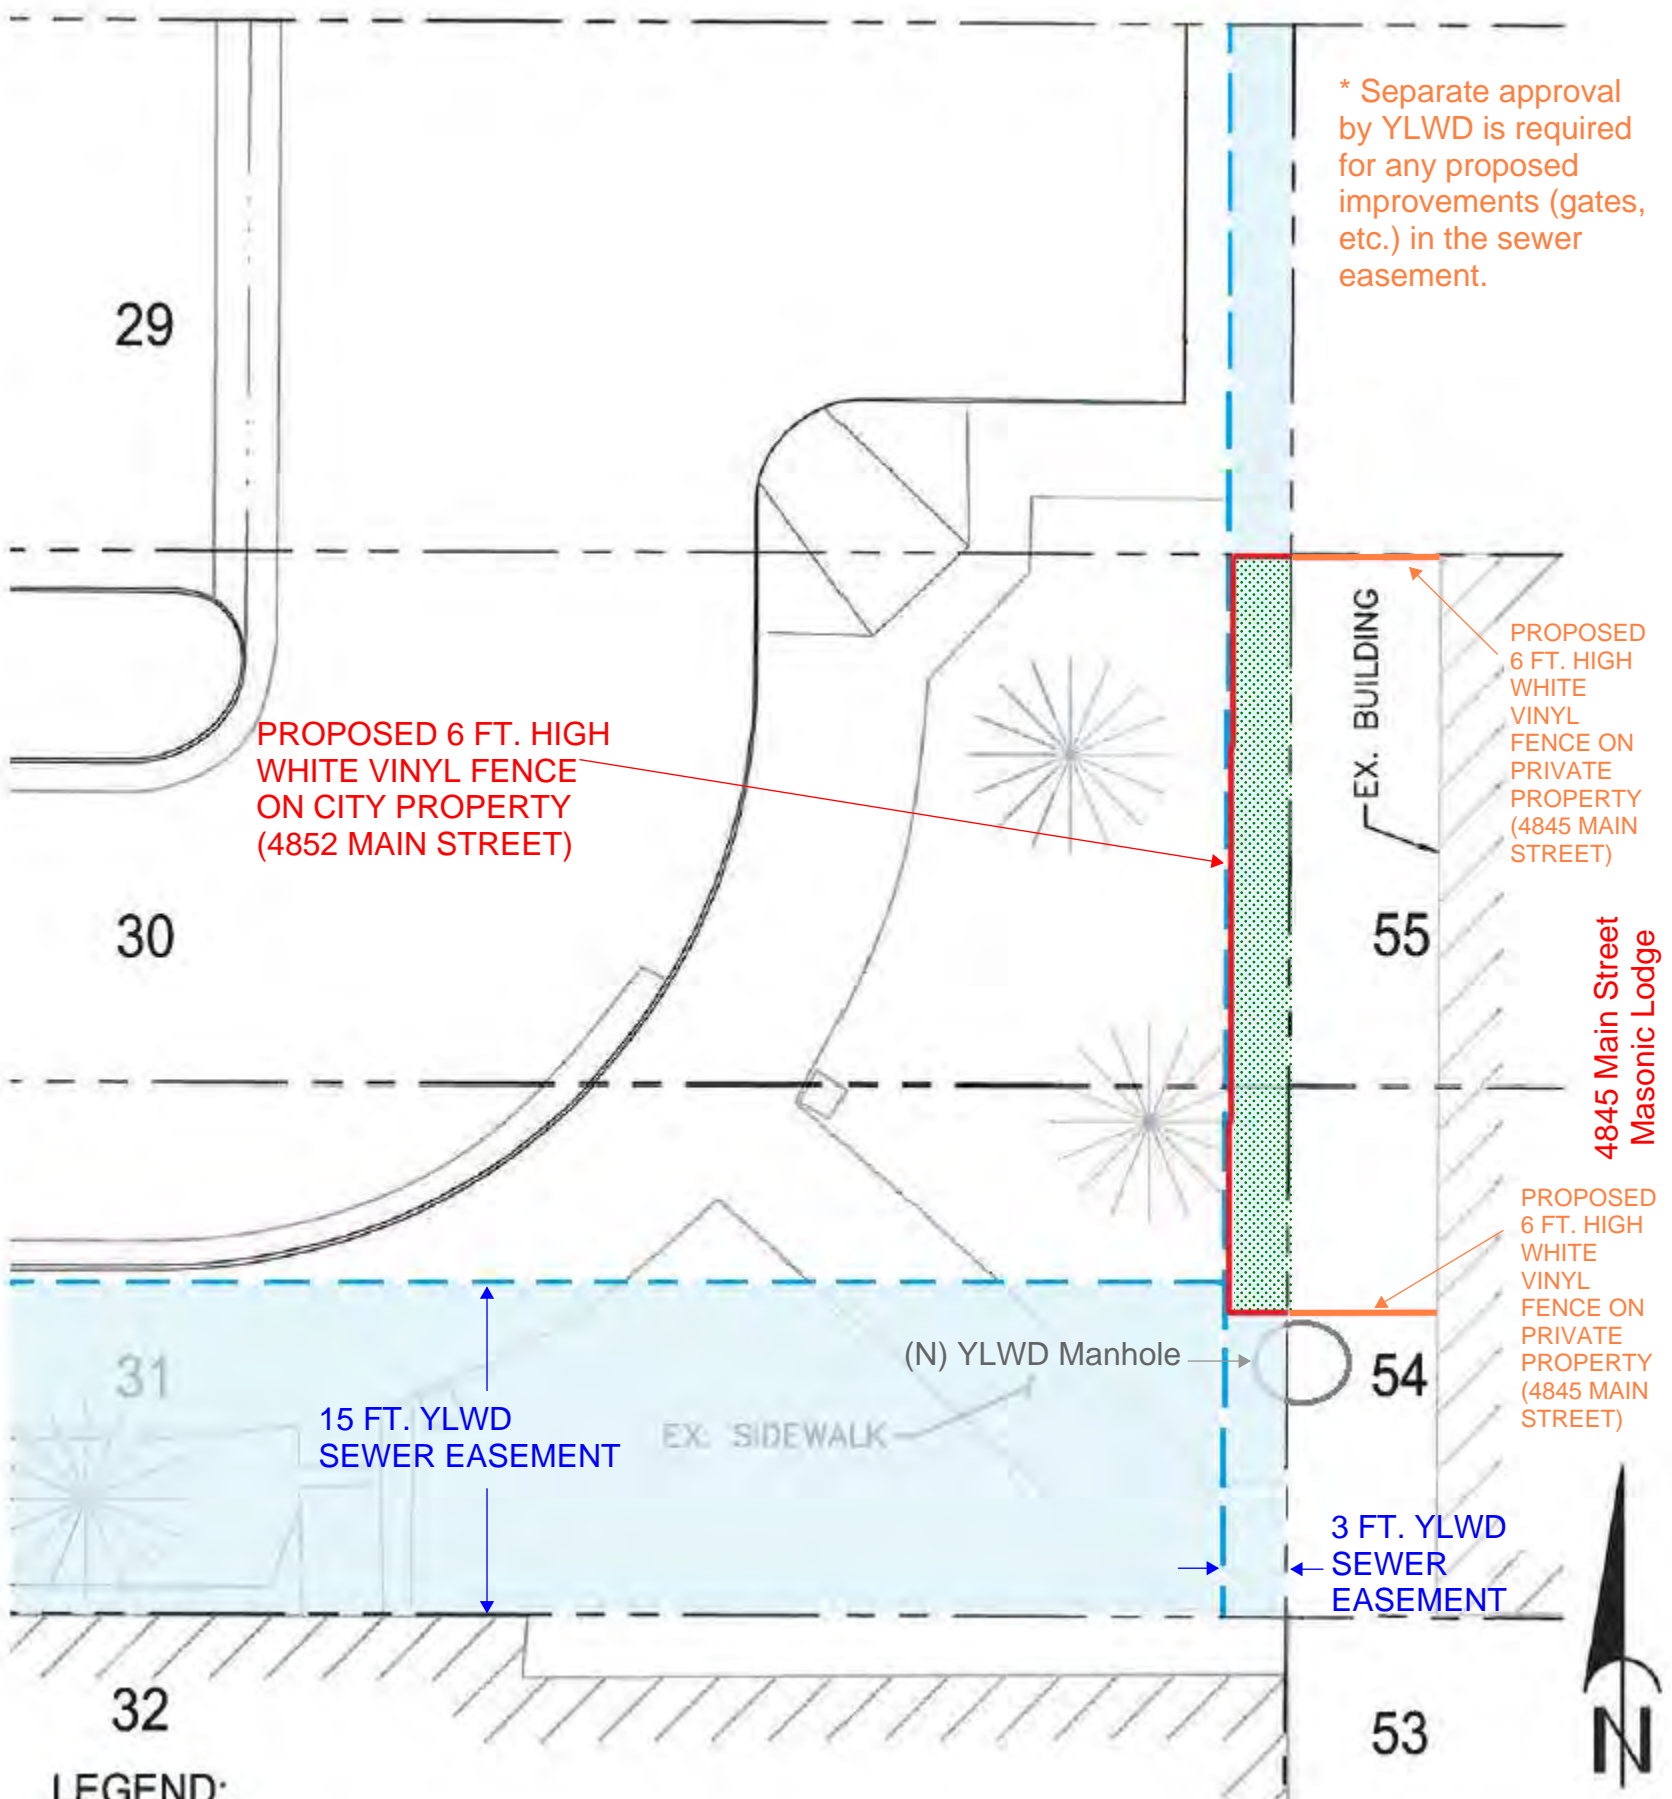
EXHIBIT B: SITE PLAN WITH IMPROVEMENTS
